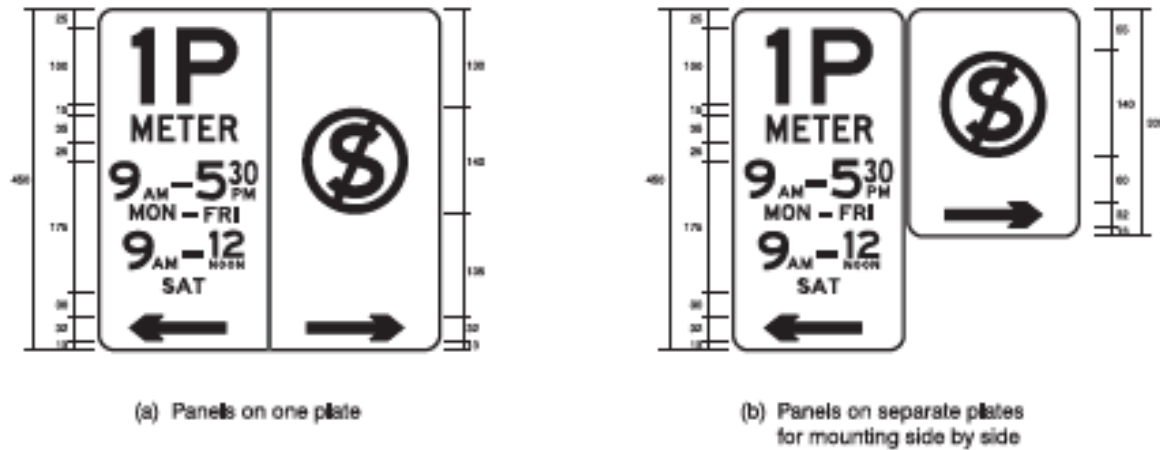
LAYOUT OF SIGNS - EXAMPLE 1
